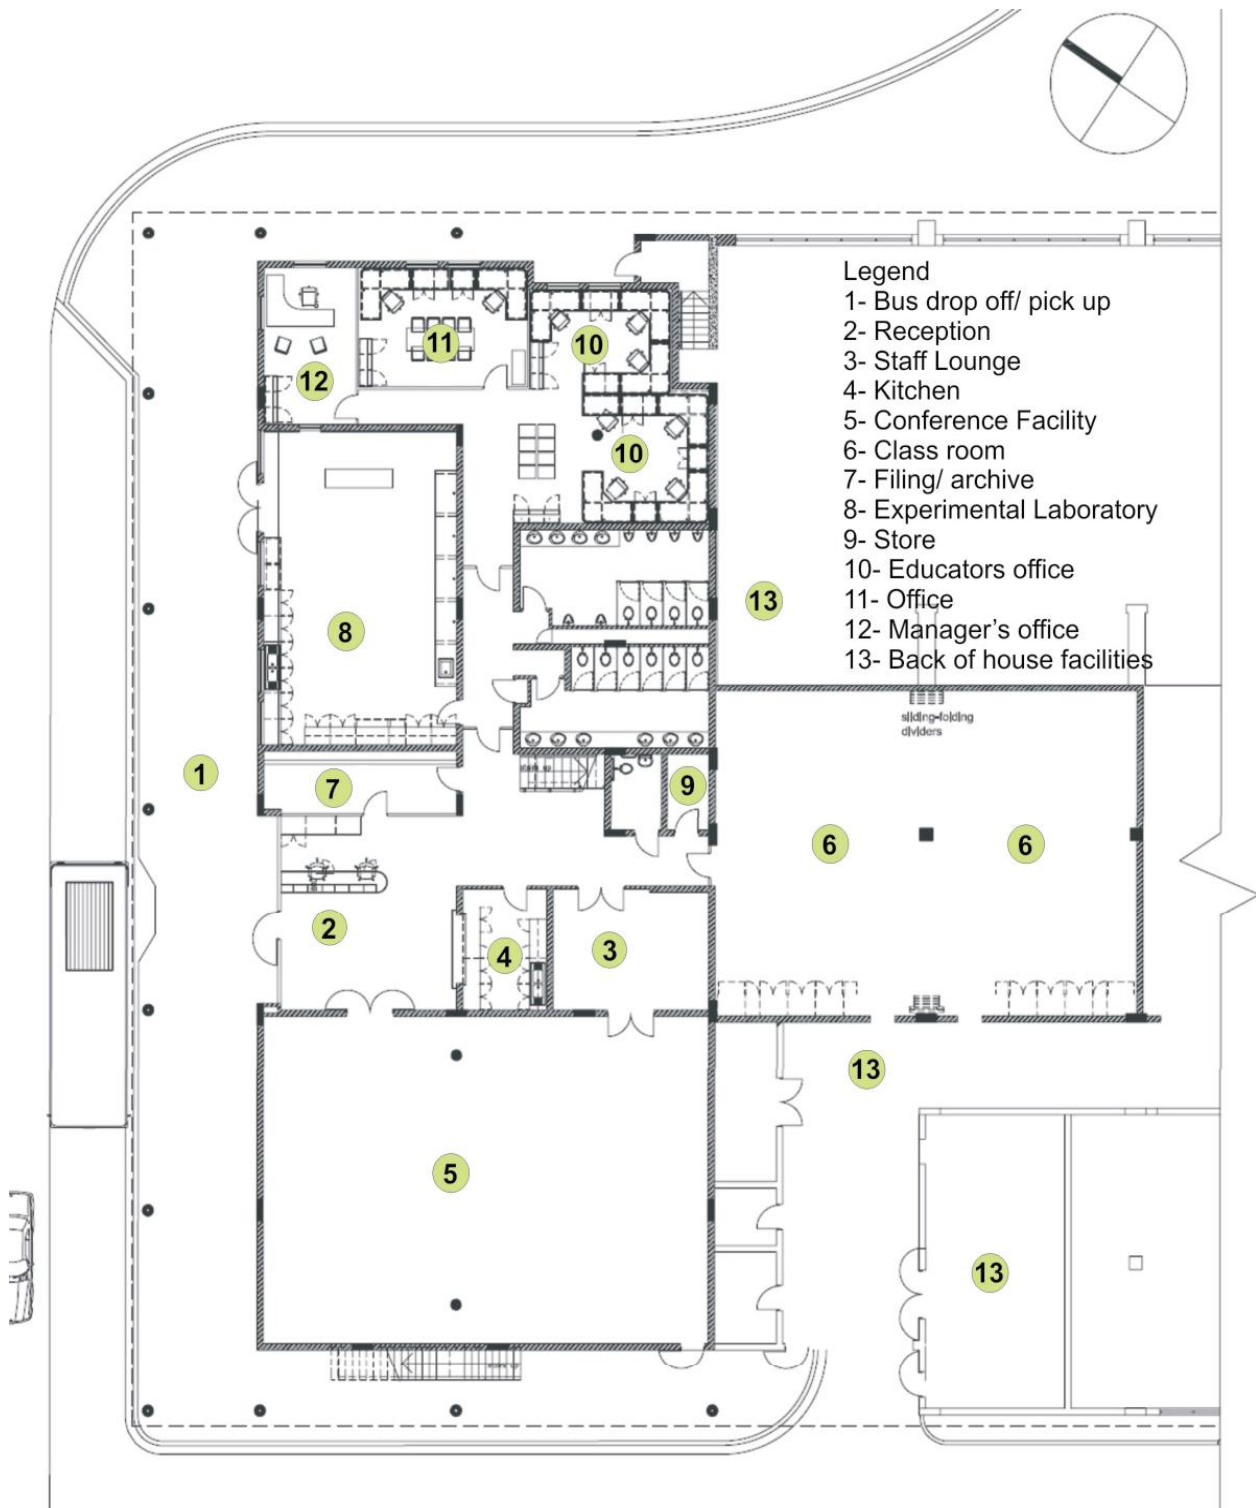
Plan of uShaka Education Centre (Source- Bellingan: 2008, 57)
